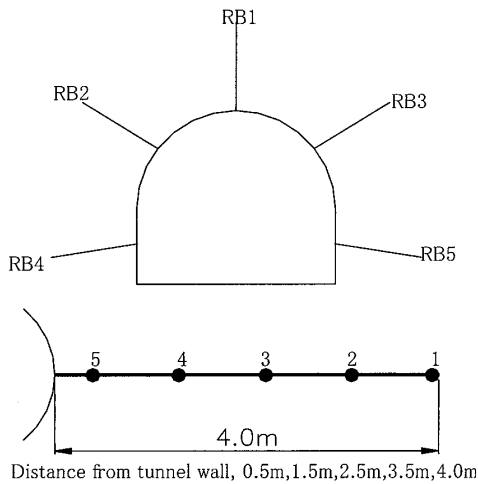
Test arrangement of rock bolts in Holland Slope Tunnel (No.68+28, Section C).
